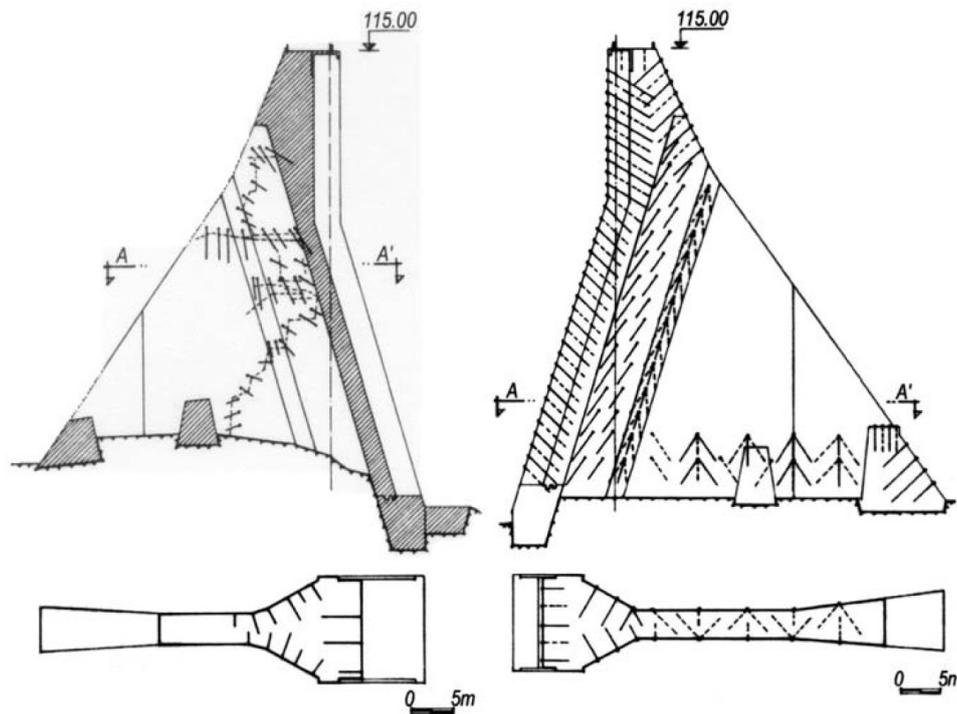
Pracana dam. Individual crack treatment (on left) and drilling pattern for mass treatment of the concrete (on right) [34]
